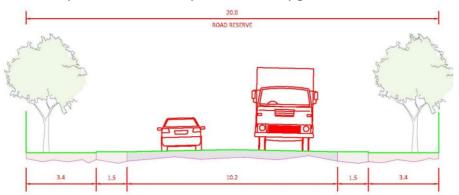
Concept cross section as per the recommendation in SA Infrastructure Guideline
